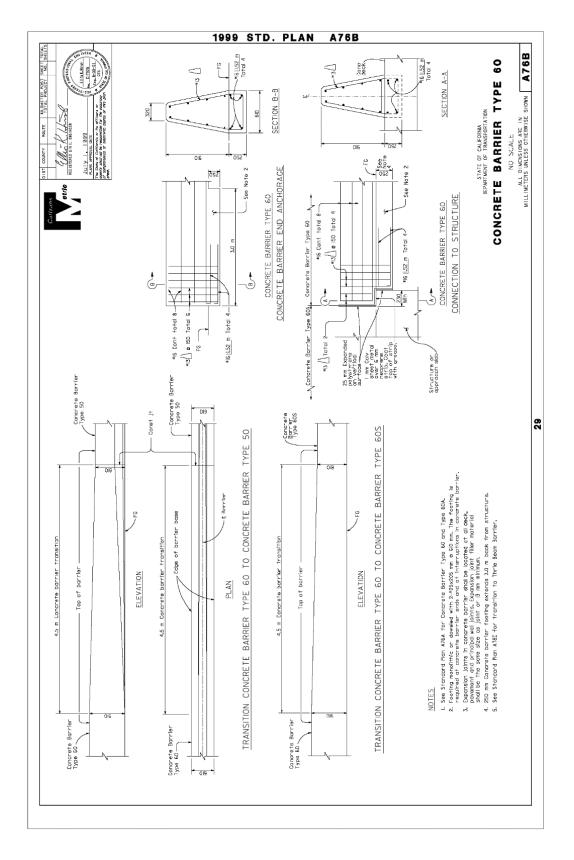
Standard Plan for Type 60 Barrier (End Anchorage)
